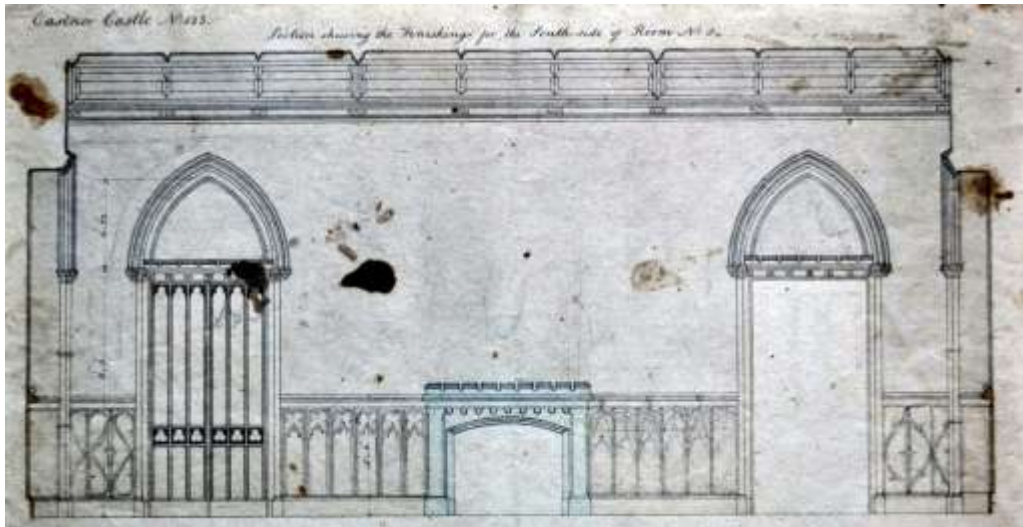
Part of Plan 123 – ‘Section shewing the Finishings for the South Side of Room No. 8’ (Dining Room) – dated 6 May 1814 (Eastnor Castle)
